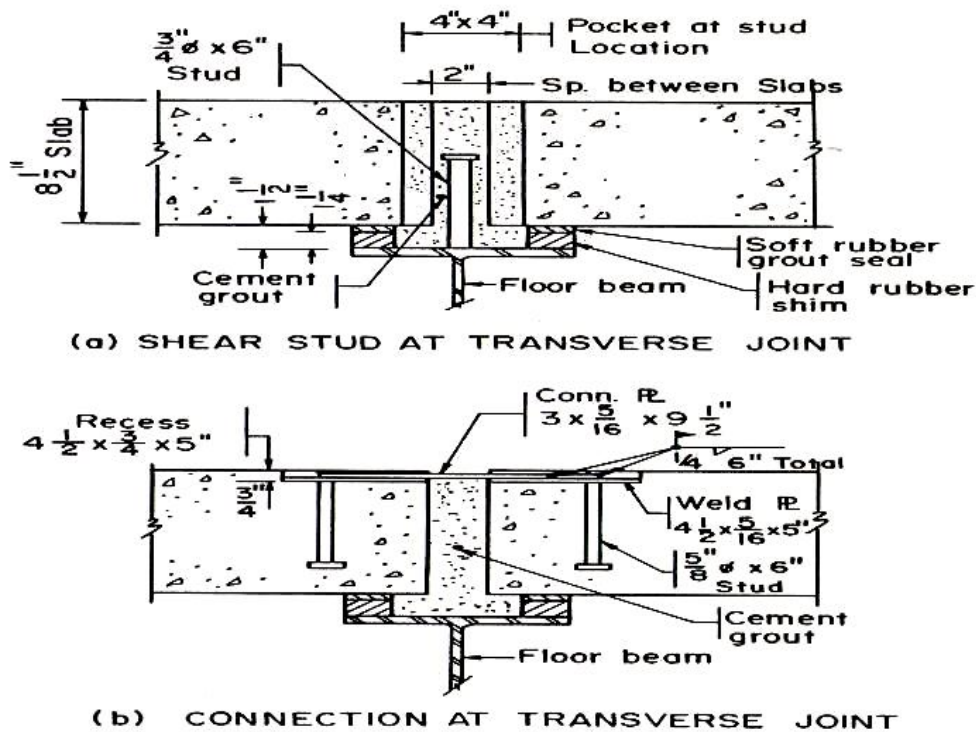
Panel-to-panel connection details of the Batchellerville Bridge
